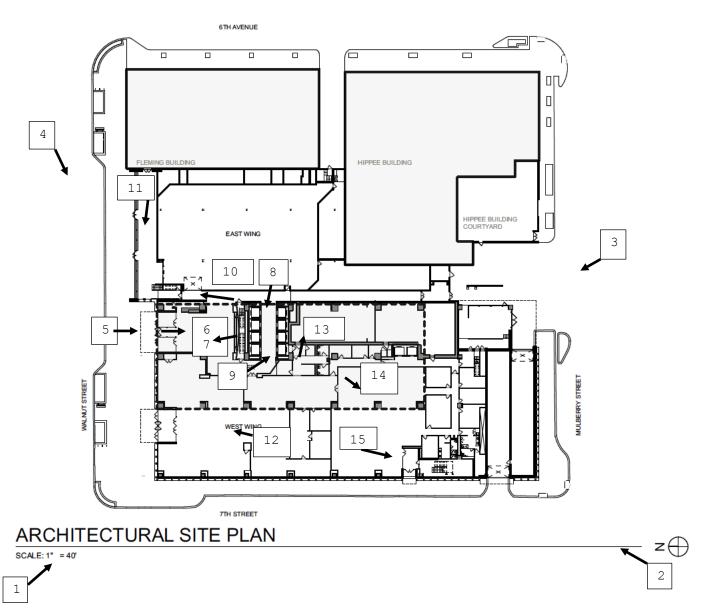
Site Plan and Photo Location Map showing the first floor of the Financial Center Office Building, Des Moines, Iowa. (Slingshot Architecture).
